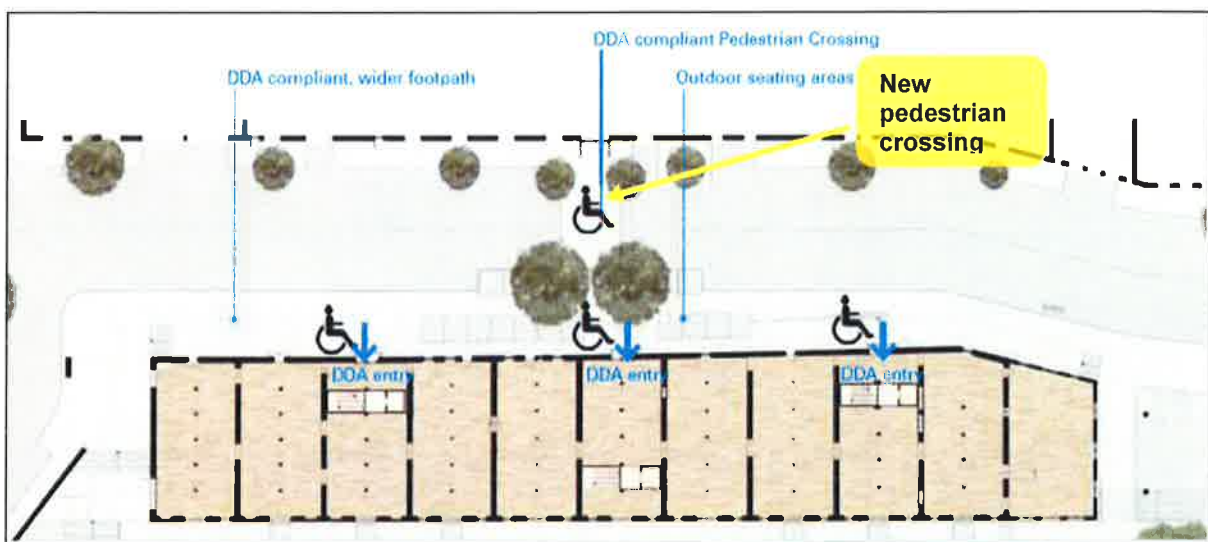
The proposed widened footpath on the eastern and western side of Hickson Road, pedestrian crossing and outdoor seating (Source: Applicant's RTS).
